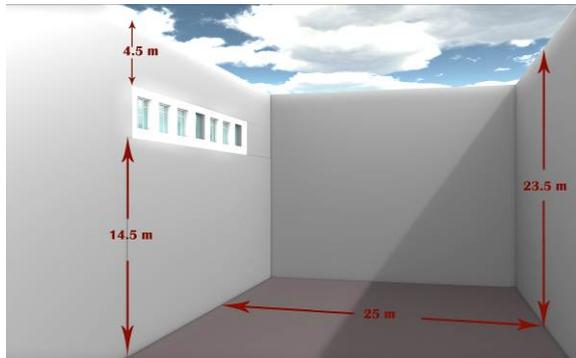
Position of the windows within the building structure and obstructions due to courtyard-perimeter.
